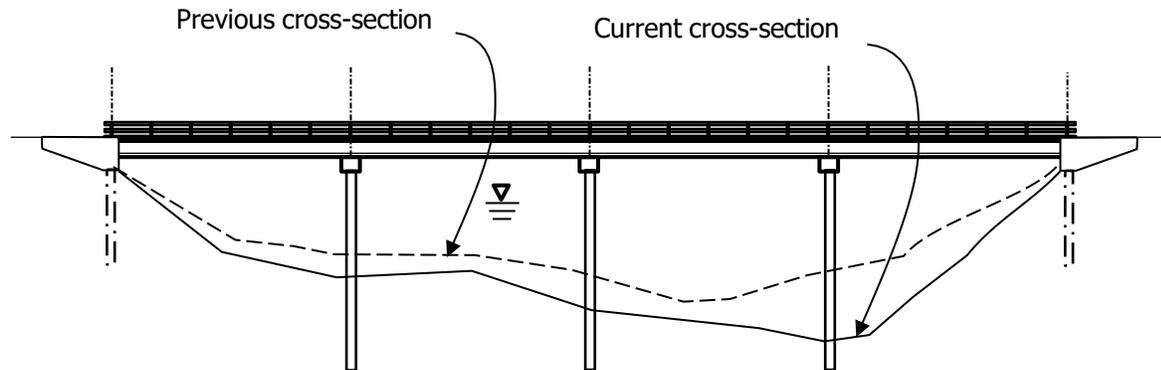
Elevation view showing current cross-section and previous cross-section for a bridge over water.
